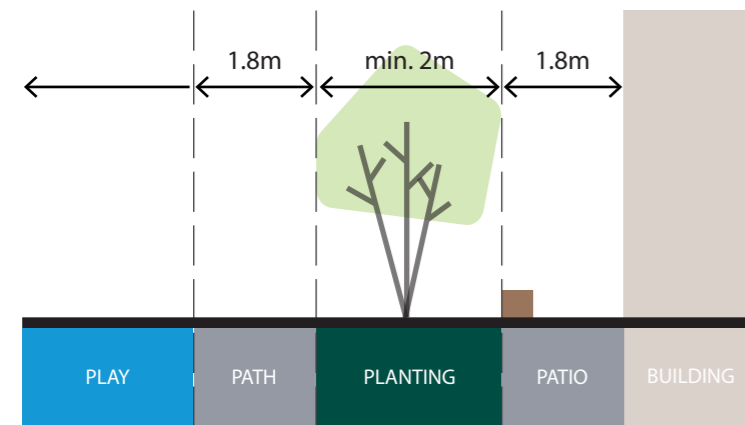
Courtyards and Accessible Rooftops Overview Plan
